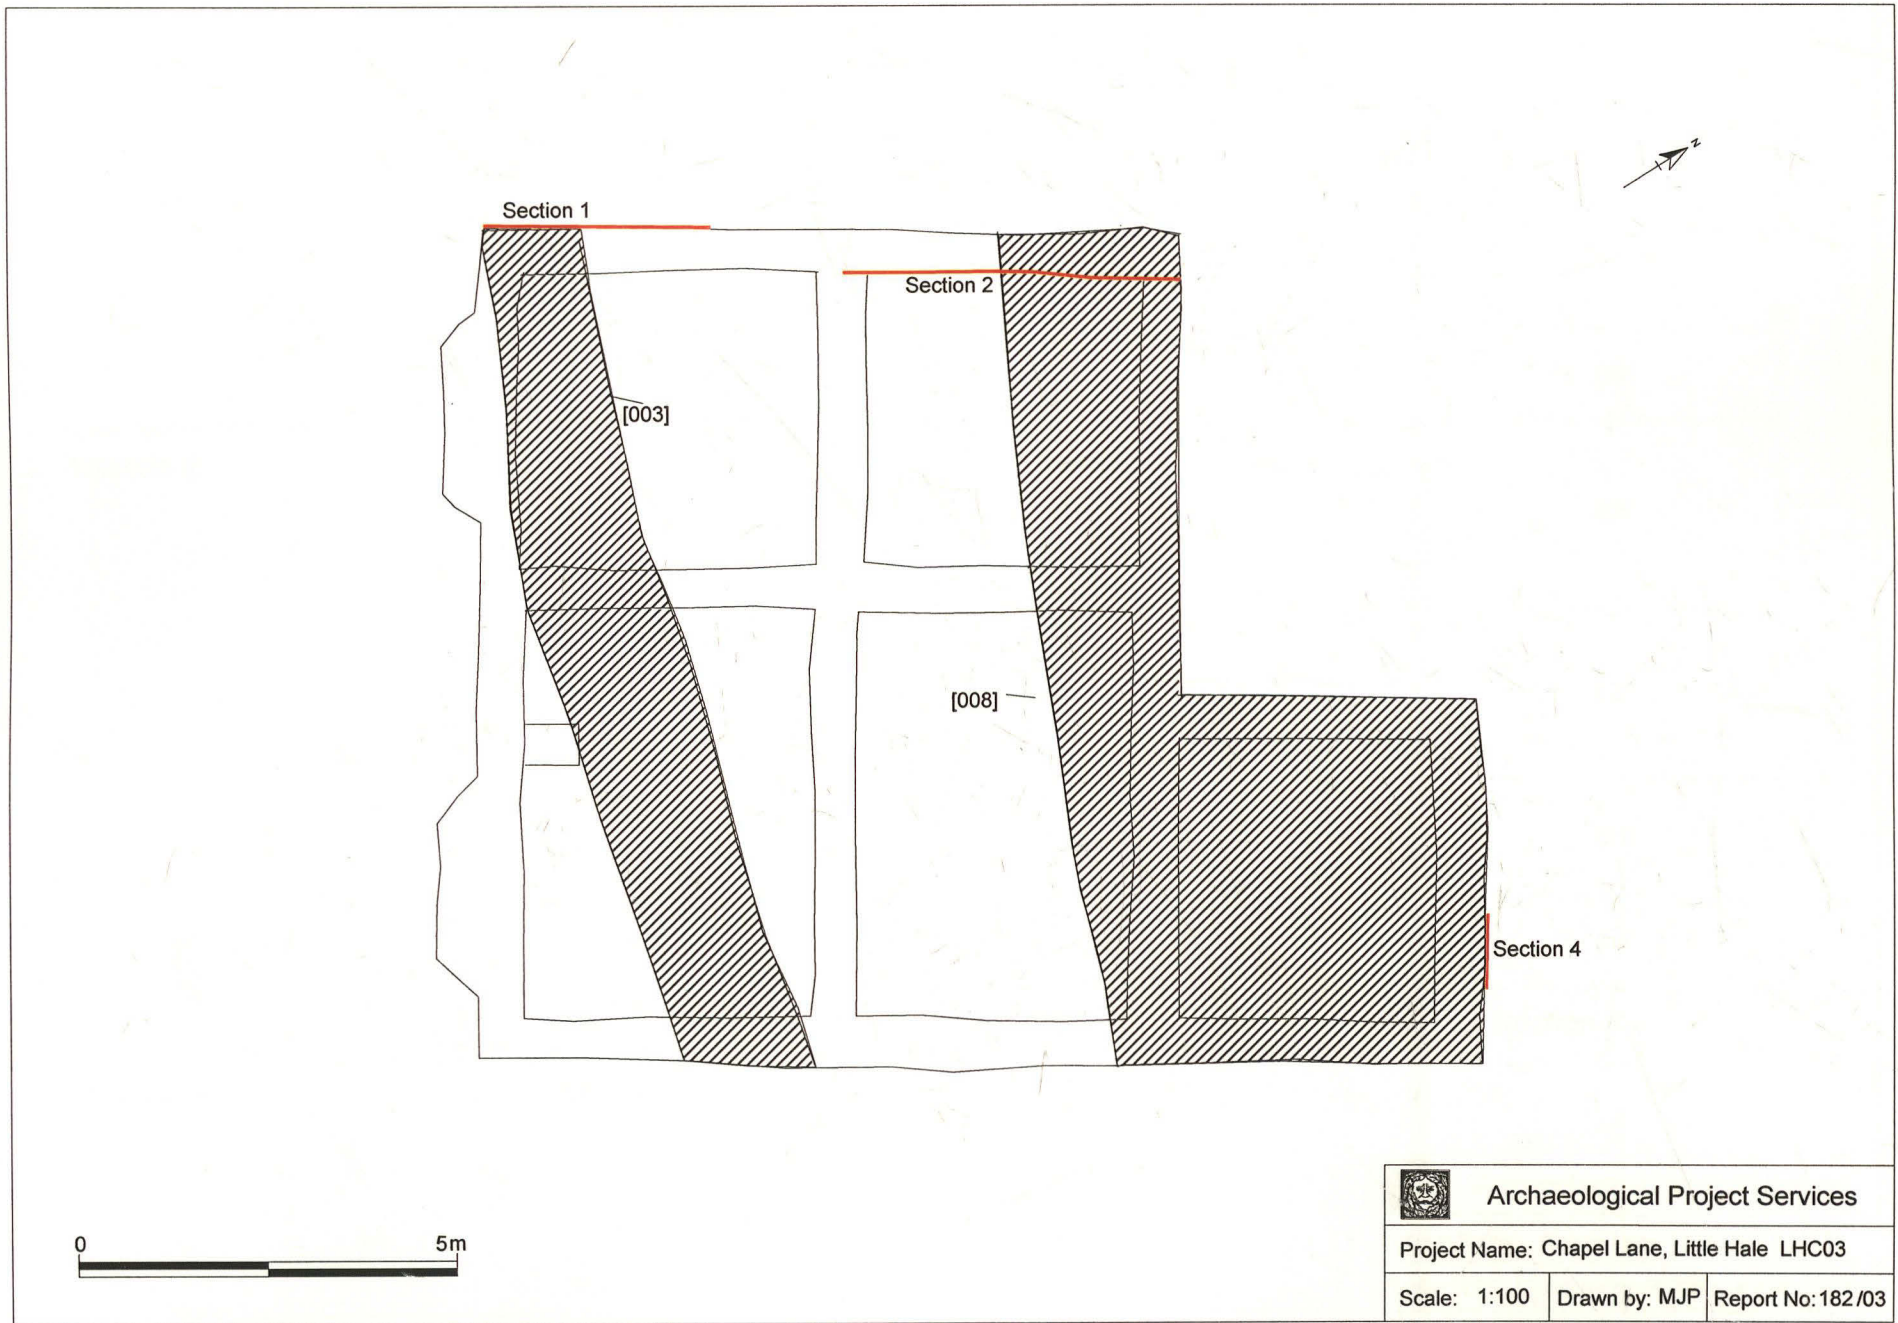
House Plot Trench Plan showing Sections 1, 2 and 4
